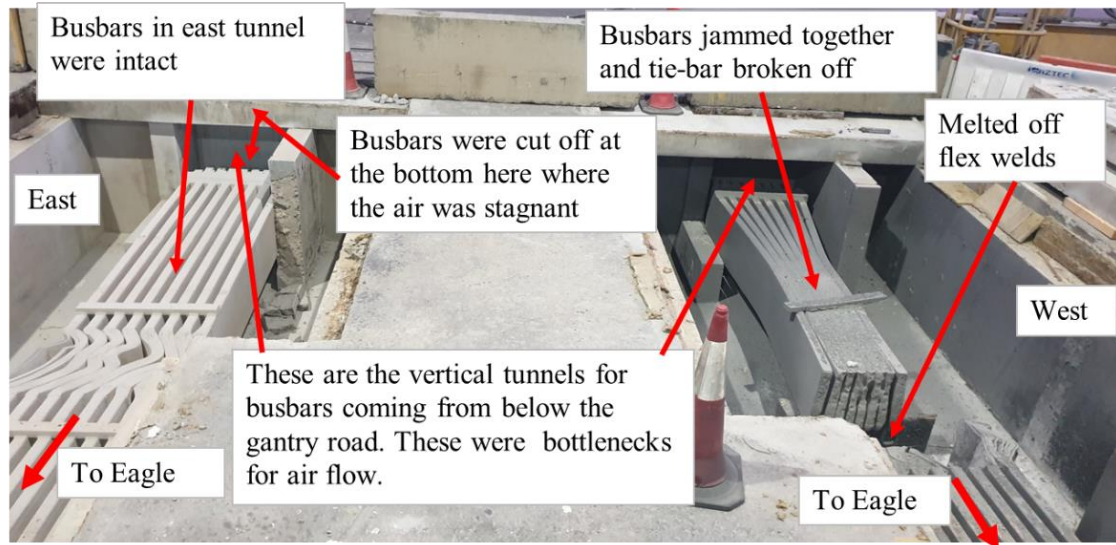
Damaged tunnel walls in Potline 6 south below the gantry road, which had to be rebuilt.
